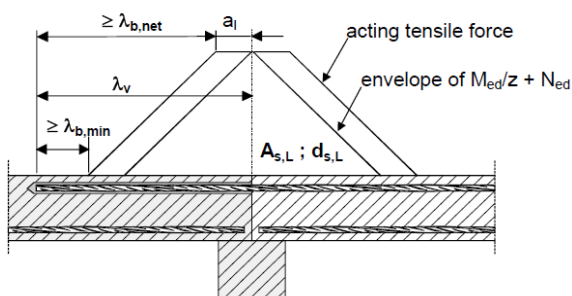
Anchoring of reinforcement to cover the line of acting tensile force
